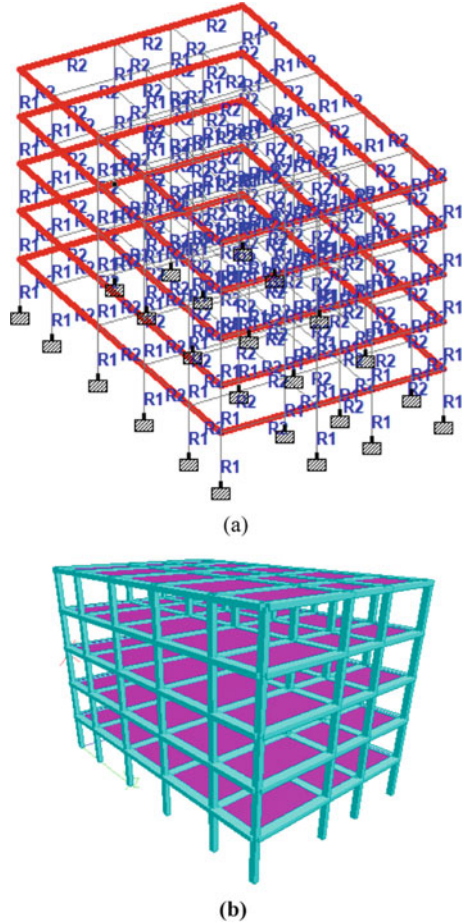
a Floor plan for stress analysis b Elevation height for each floor Column having a size of 300 \* 400 mm is used with concrete as column material. Here the 150 mm thickness plate is used across all storeys with concrete as plate material [22]
